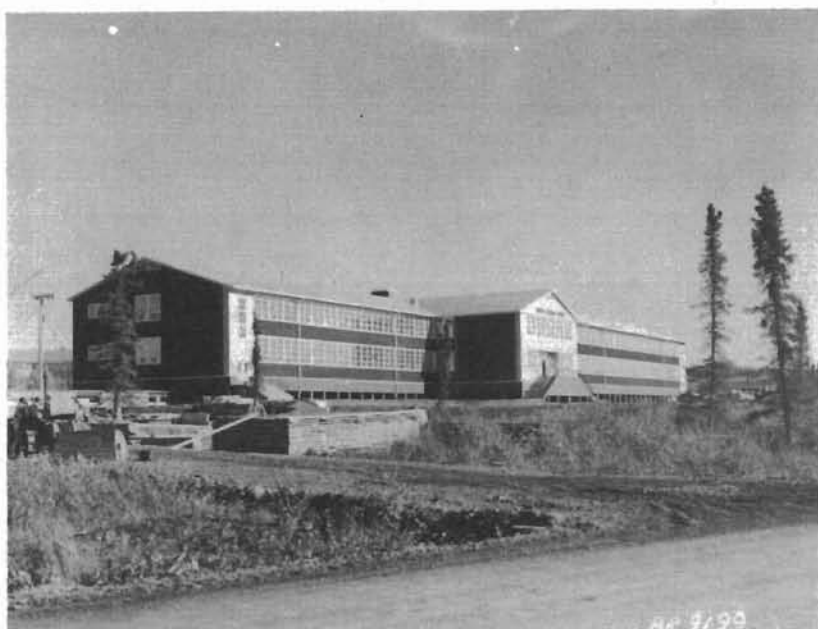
Two-storey wood frame school on pile foundation in continuous permafrost zone.
